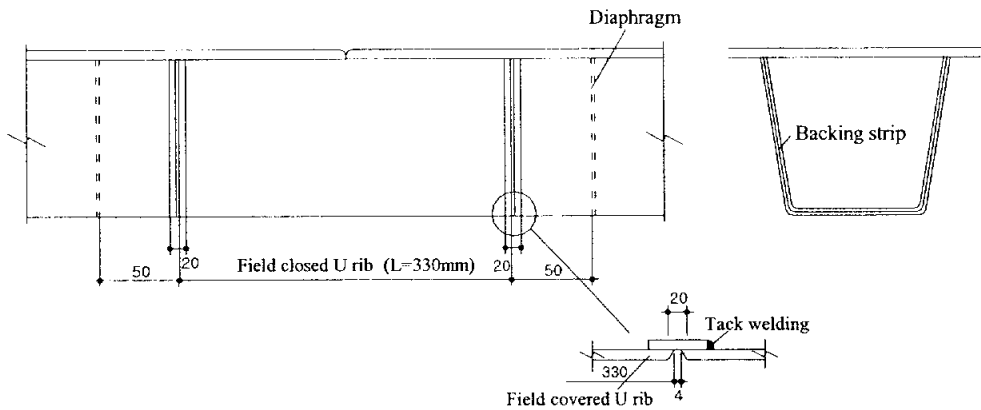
Detailed Description of Field Welded Joint of U Rib
